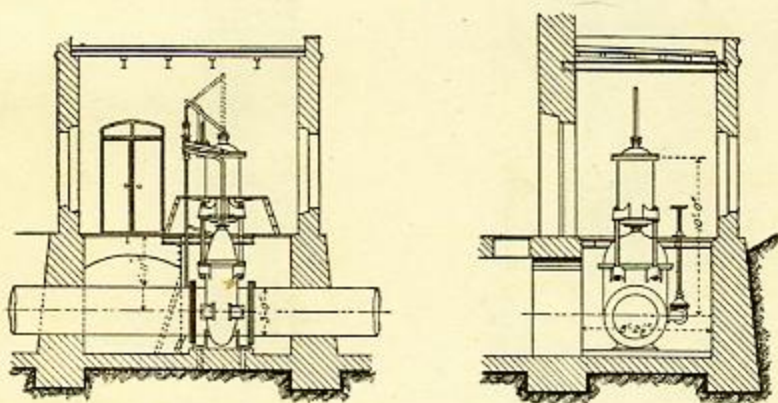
Gate Valve Operated by Hydraulic Cylinder.
